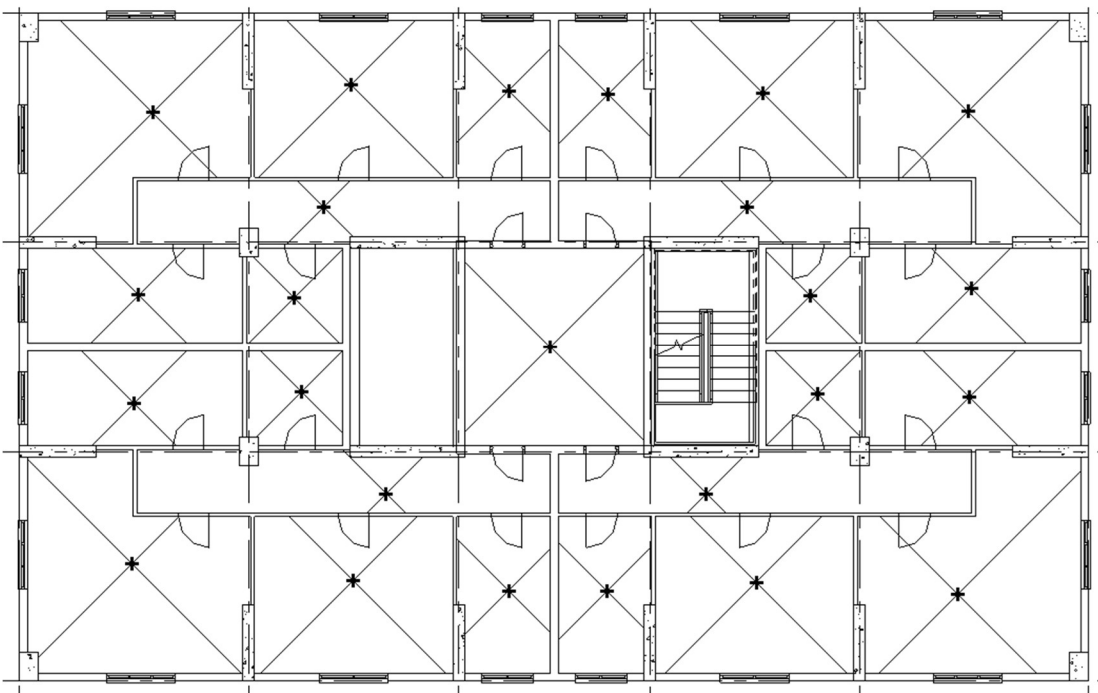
The layout of reinforced concrete system with shear wall prototype 3
